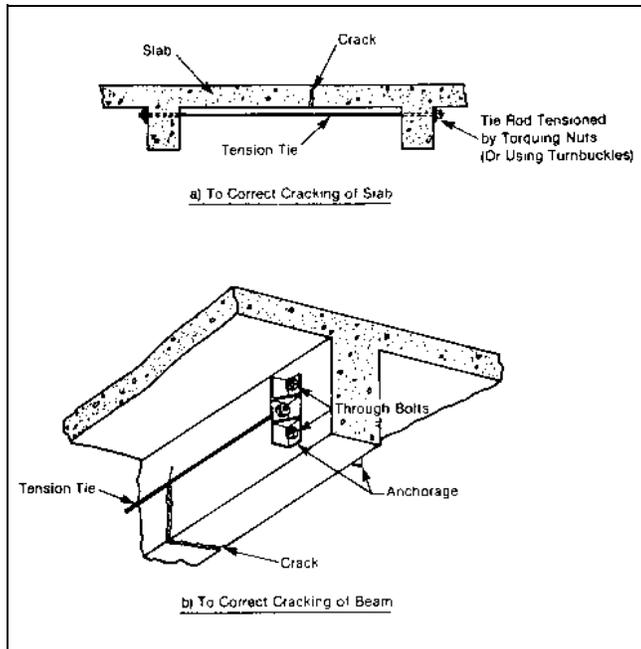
Crack repair with use of external prestressing strands or bars to apply a compressive force
